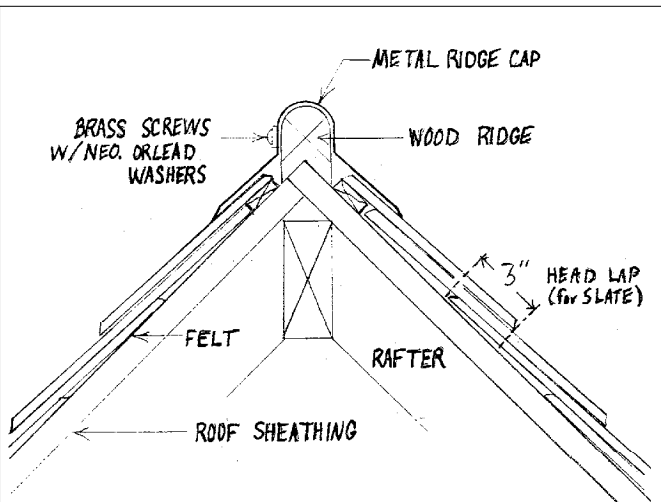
Metal ridge cap: Not always the best looking, but takes the abuse of ladder hooks and foot traffic on a slate ridge.
